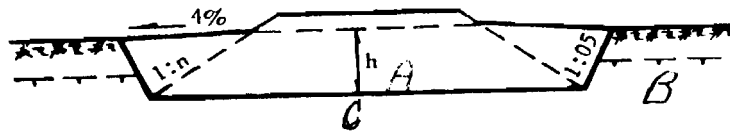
Schematic Diagram showing Cross Section of Fill for an Embankment 0.5 m in height
